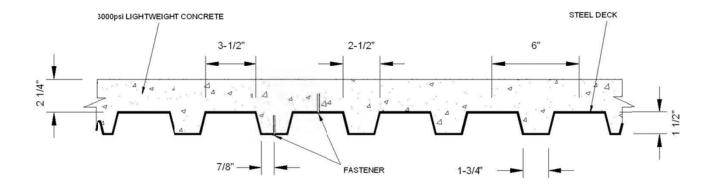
FASTENER INSTALLATION LOCATION IN SAND-LIGHTWEIGHT CONCRETE FILLED 11/2 INCH DEEP STEEL DECK
